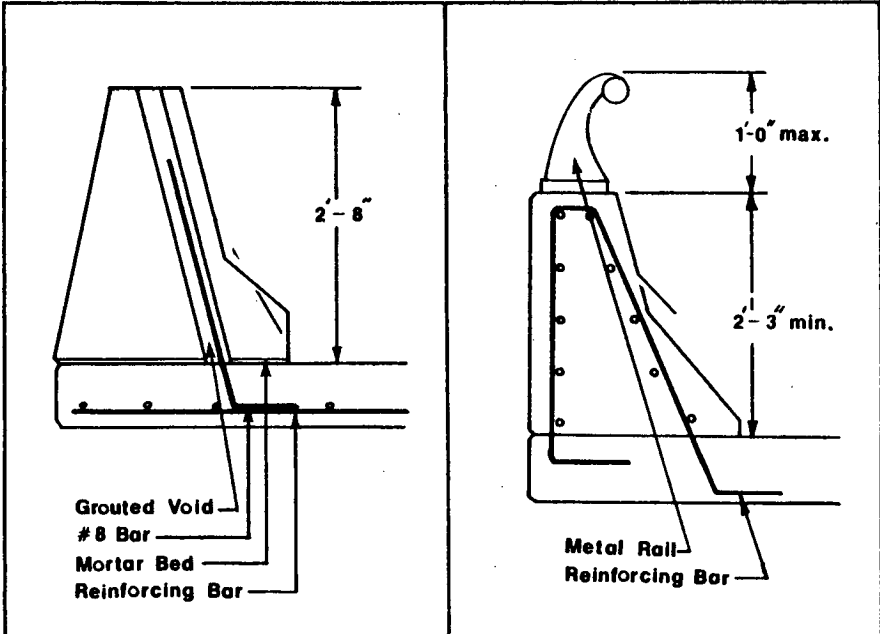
Precast Concrete Parapet Figure 39. Site Cast Concrete Parapet
